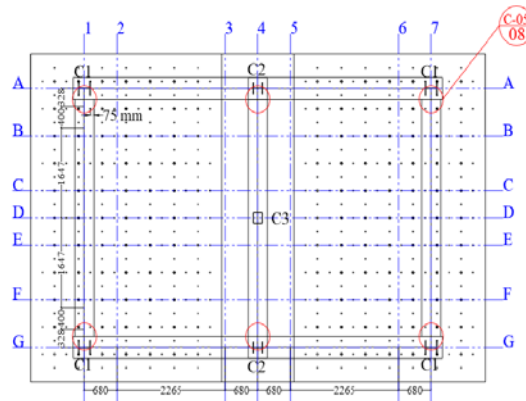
Plan of Test Frame (drawn by Bagheri/Yan)
